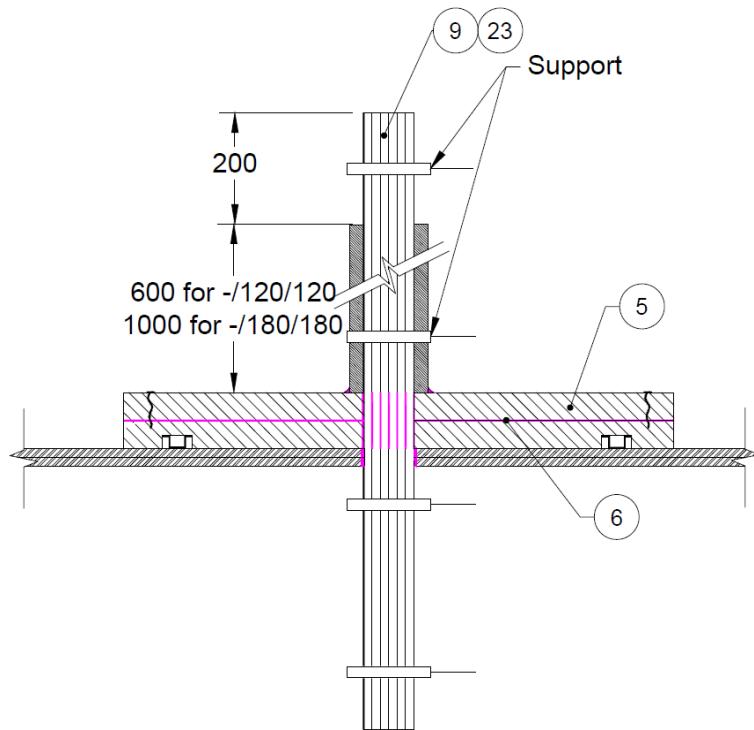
Section View of D1 and D2 Cables with/without Cable Trays in TBA Firefly™ Intubatt not against Wall Construction in Horizontal Substrates - Wrapping topside only
